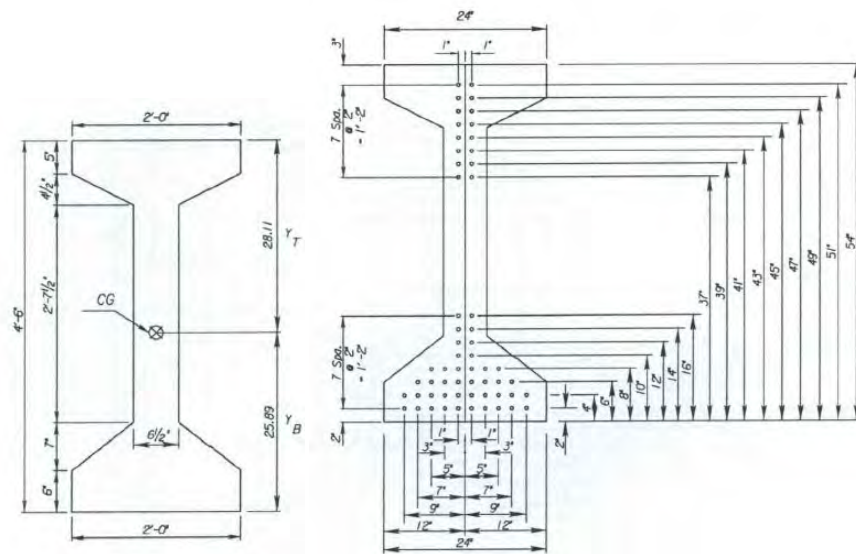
K-4 girder geometry and strand layout (KDOT 2016)
